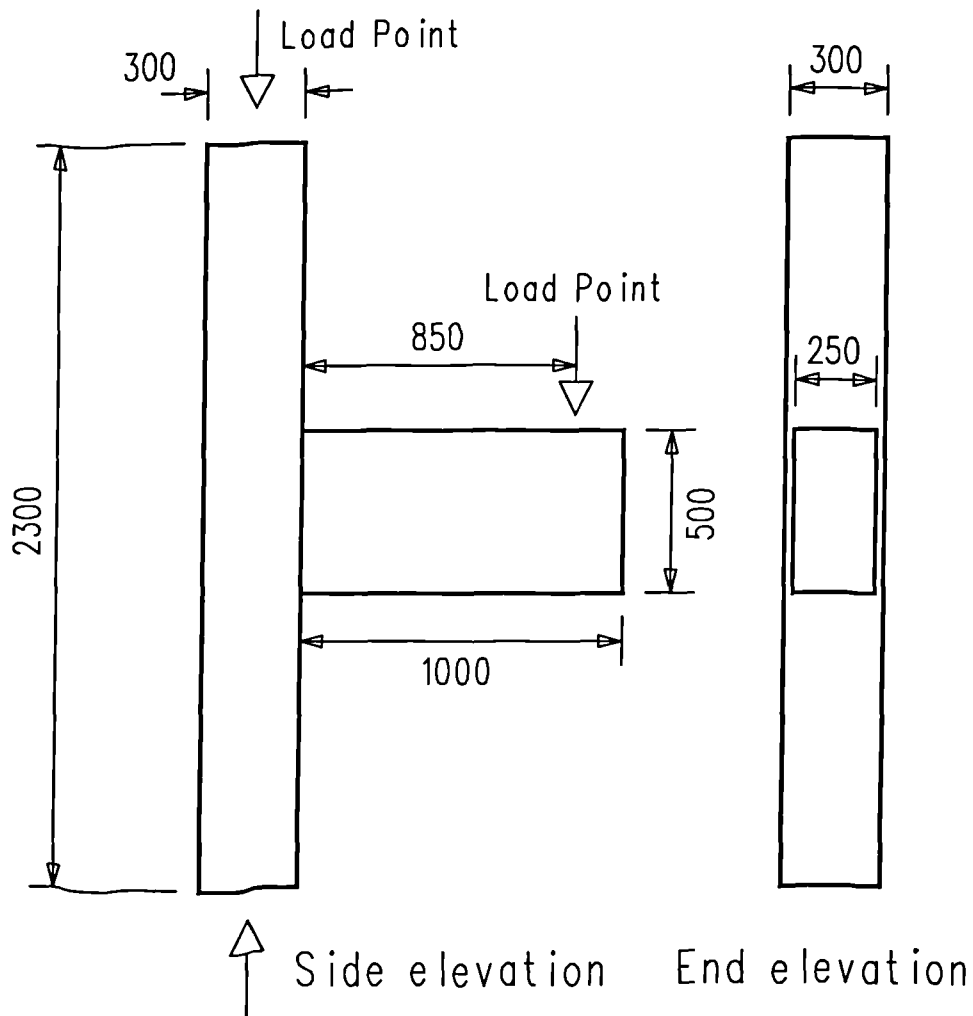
Specimen layout (dimensions in mm) - Parker [11]
